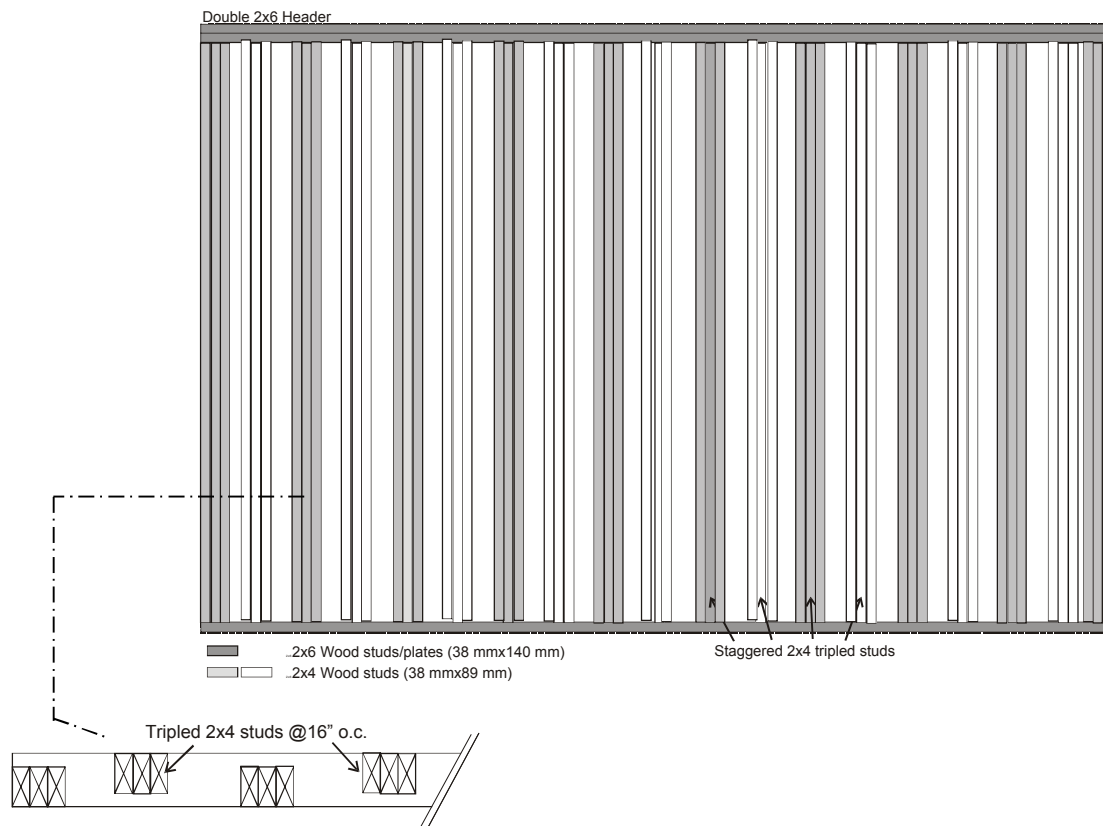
5: Framing details tripled 2x4 staggered stud wall with studs spaced 400 mm
